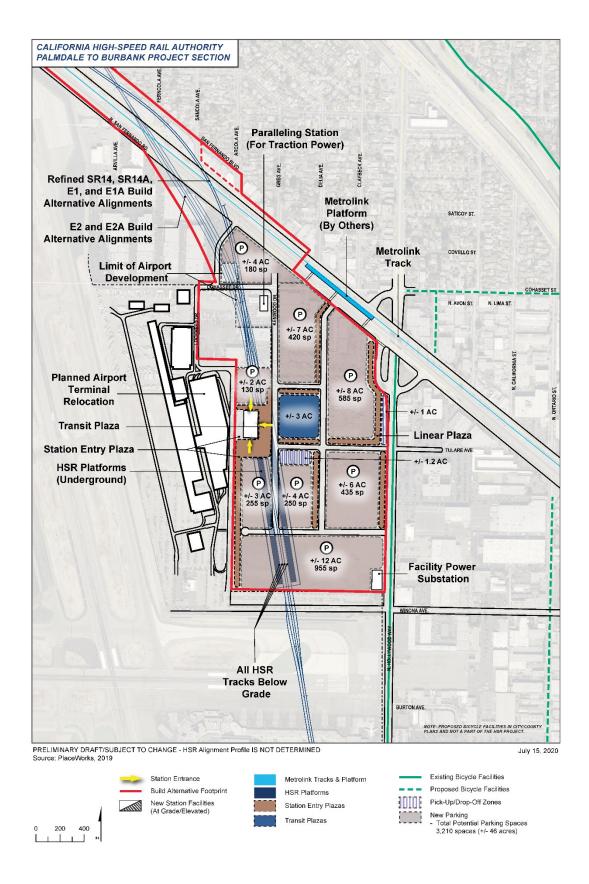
Burbank Airport Station Preliminary Station Concept Layout Plan
